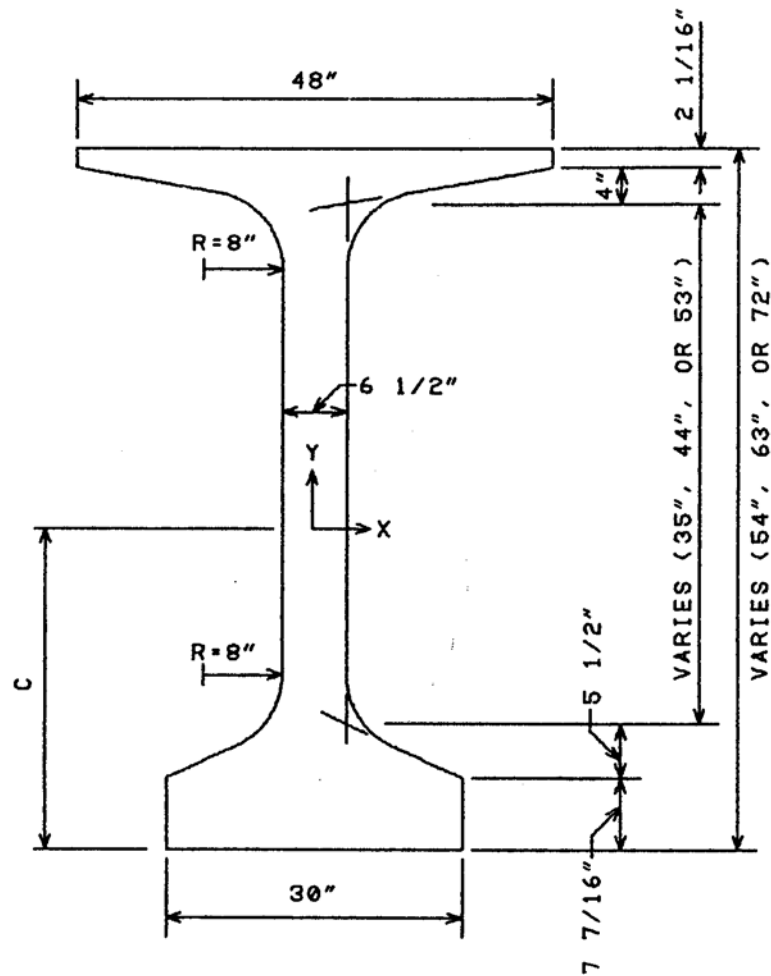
SKETCH SHOWING TYPICAL BULB TEE CROSS SECTION
